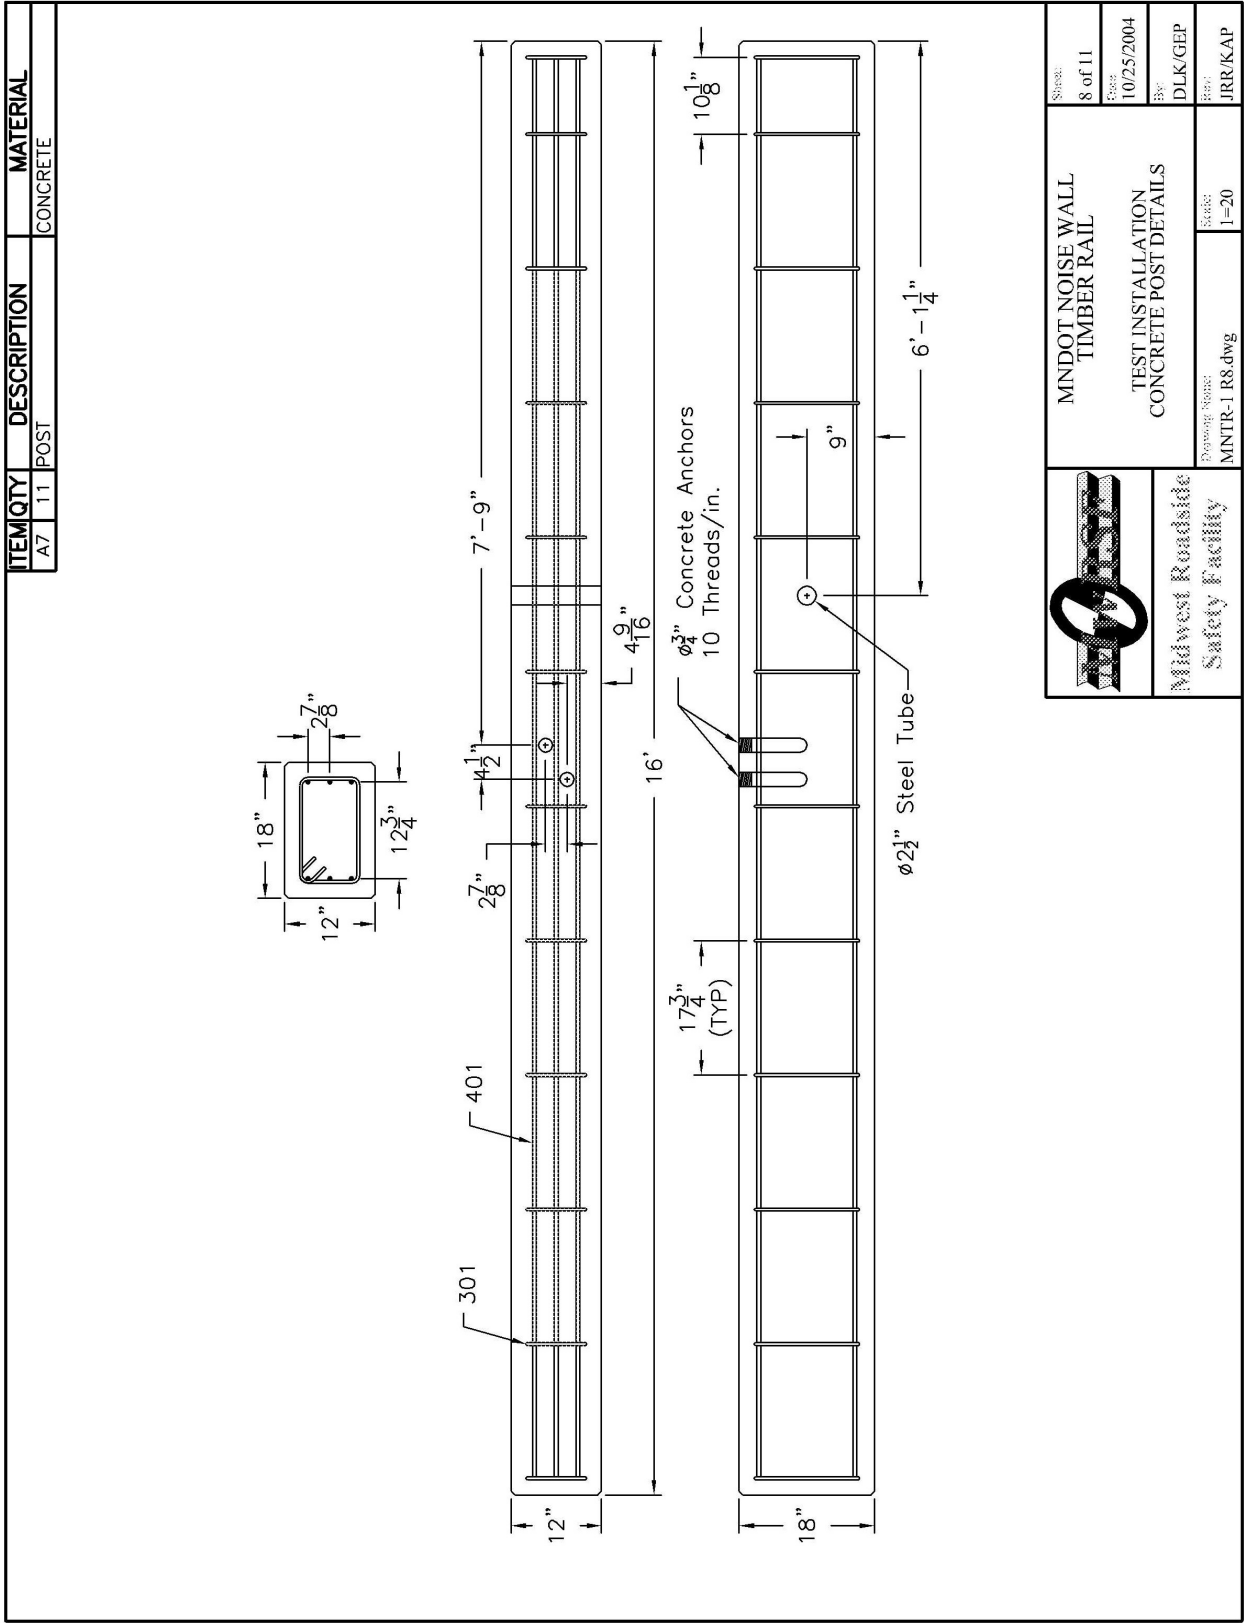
Mn/DOT's Timber Rub Rail Design Concrete Post Details (English)
